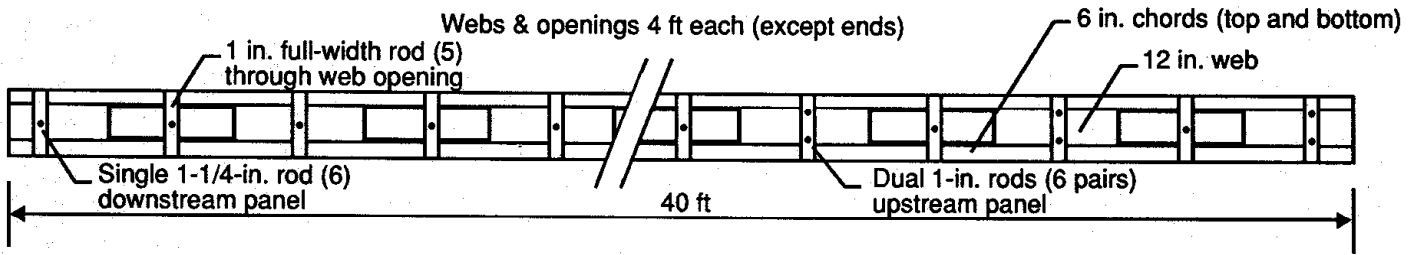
Elevation view of bridge, showing 6-in. chords, 12-in. webs, and layout of stressing rods
